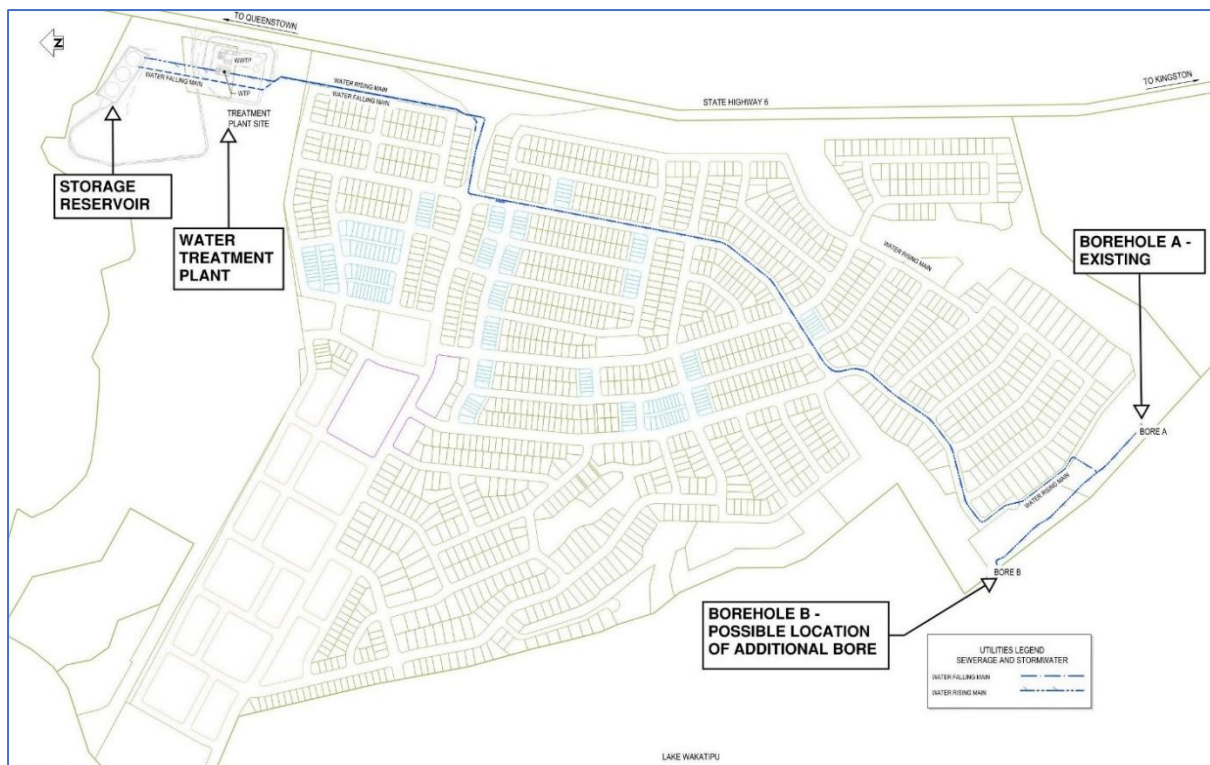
Location of the existing bore, water treatment plan and reservoirs
